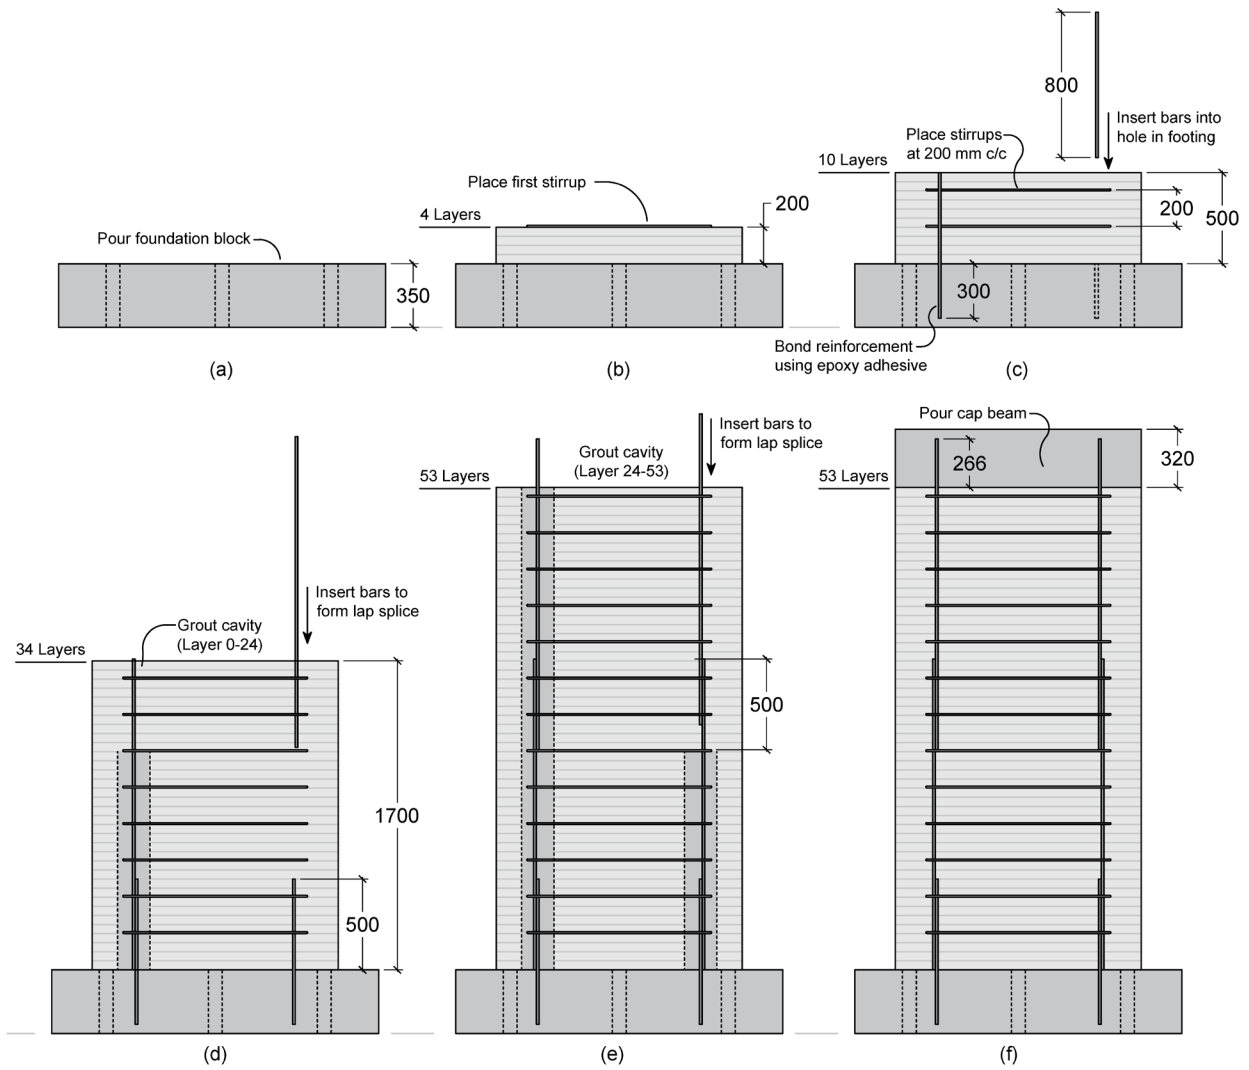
Shear wall fabrication sequence: (a) cast foundation block, (b) print first four layers and place first stirrup (subsequently spaced at 200 mm on centre), (c) drill holes in foundation and place embed vertical reinforcing bars, (d) print up to layer 34 and place subsequent reinforcing bar, (e) print up to layer 53 and place final reinforcing bar, (f) place reinforcement and pour concrete cap beam.
